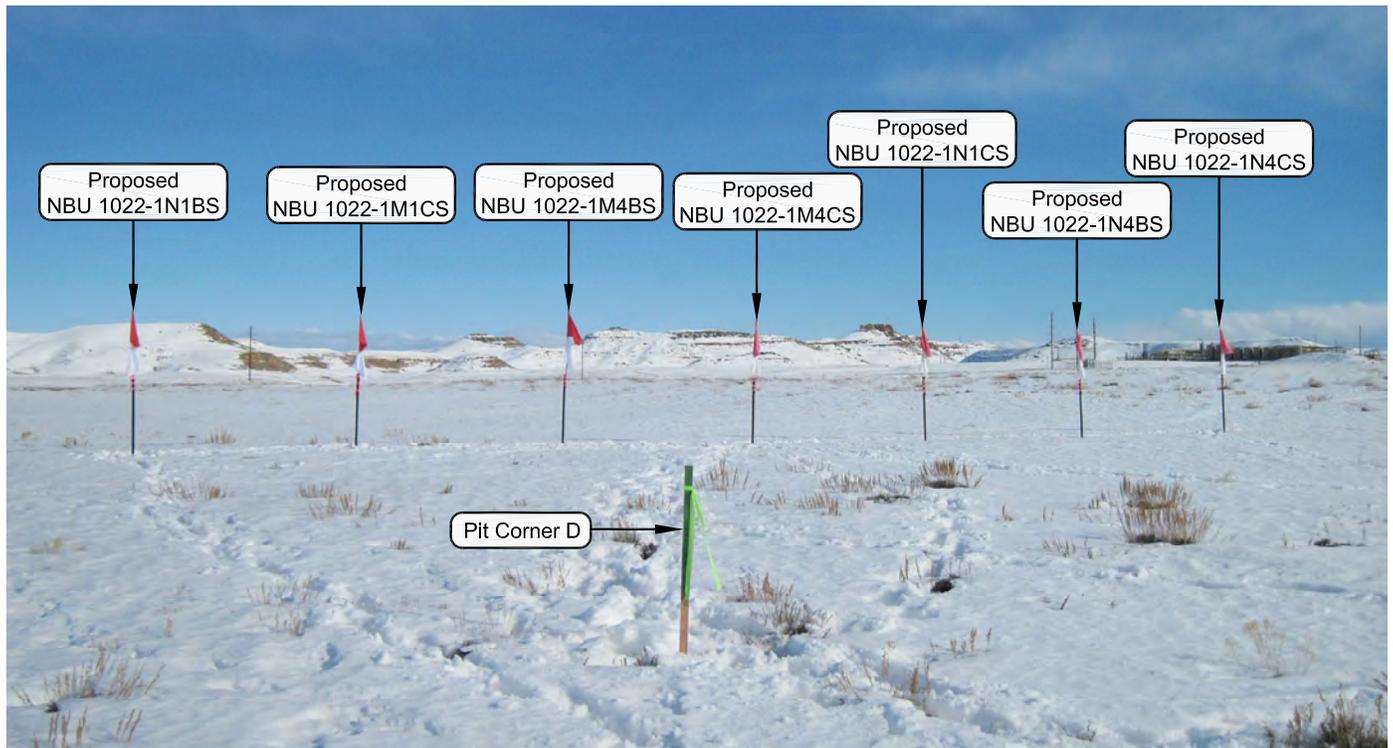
PHOTO VIEW: FROM PIT CORNER D TO LOCATION STAKE
